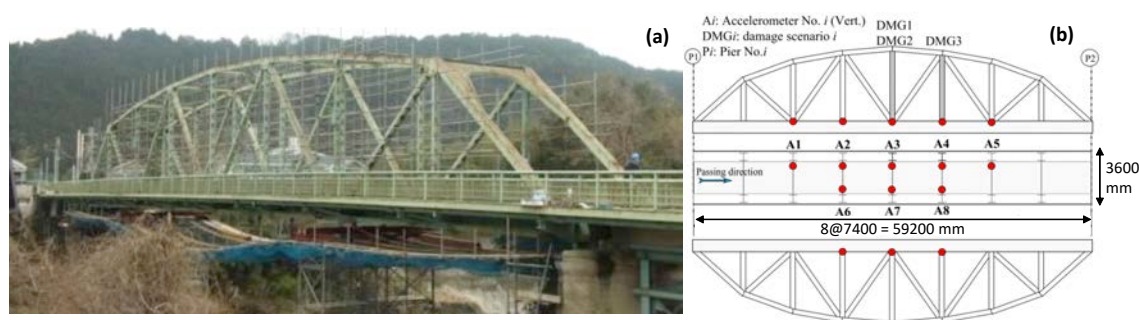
Steel truss bridge (a); sensor & damage locations (b)
